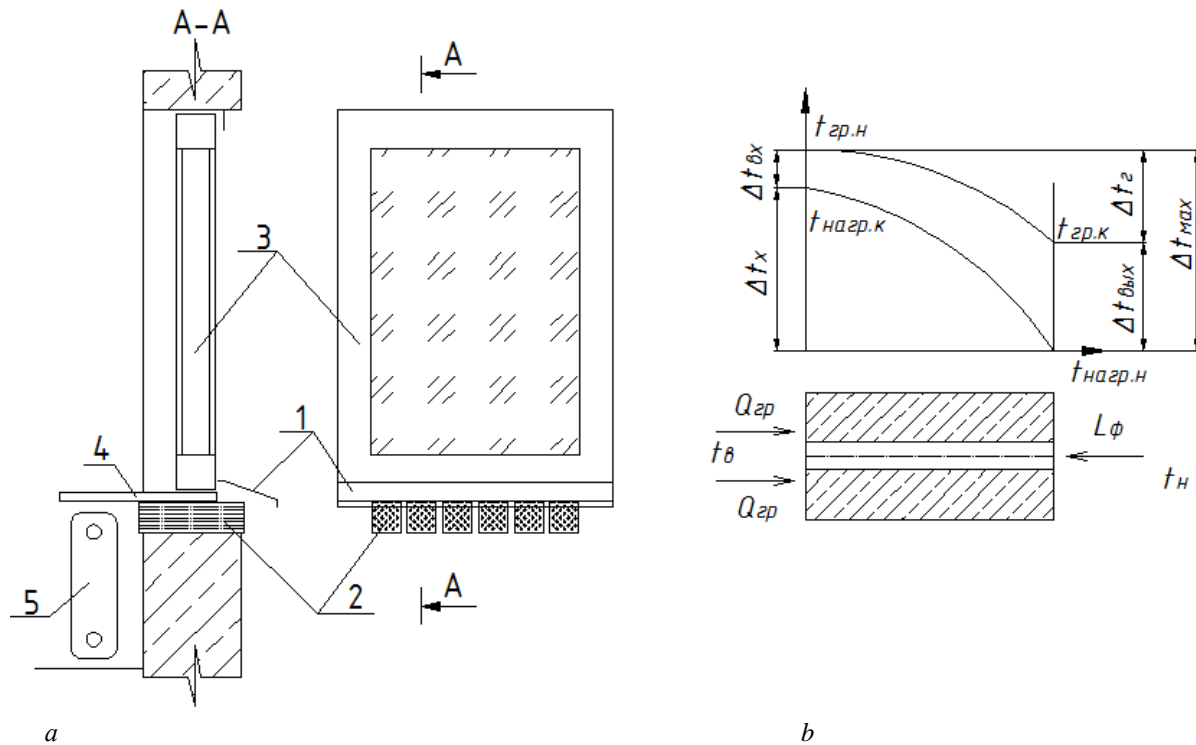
The scheme of the RAVE installation on an external wall of the building and schedules of temperature changes in RAVE: 1 – window outflow, 2 – affluent ventilation block RAVE, 3 – window frame, 4 – windowsill plate, 5 – heating device.
